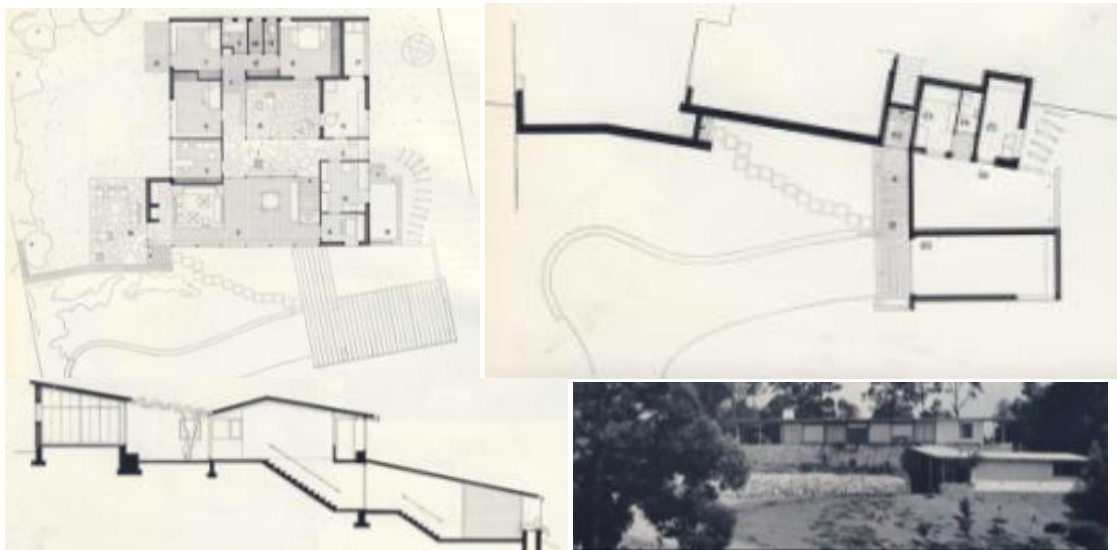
Top: House Trumpelman, Krigeville, Stellenbosch, 1954, ground floor and lower ground floor plans. Bottom: Section and view from the garden below (all Architect and Builder, V8.1, January 1958:38-42).
